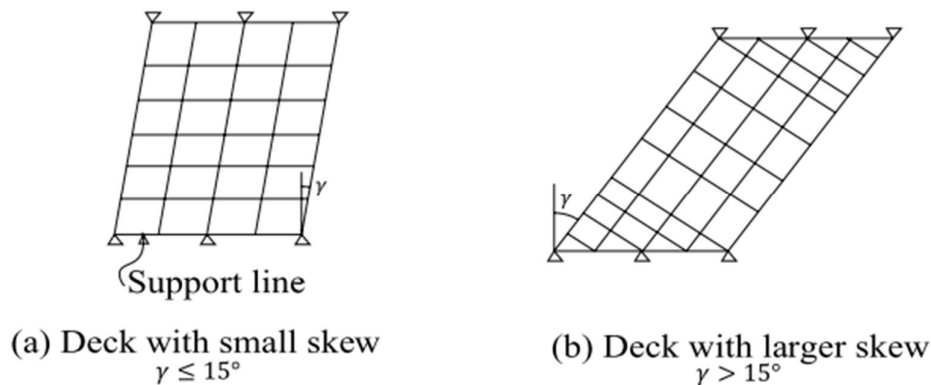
Grillage Arrangement in Skew Bridge,
